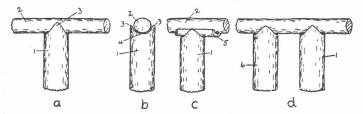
House framework: upper ends of supporting post (pou) notched to receive longitudinal beams (hapai). a, side view; b, end view; c, side view with chock to steady beam; d, side view of long house, each post reinforced by another placed close to it. 1, notched post, 6 feet above ground, 11.6 inches in diameter; 2, longitudinal beam; 3, triangular projection of notch; 4, curve of notch, fits beam; 5, chock, segment of hala trunk inserted to steady beam when notch and beam do not fit; 6, extra post used for long houses.
